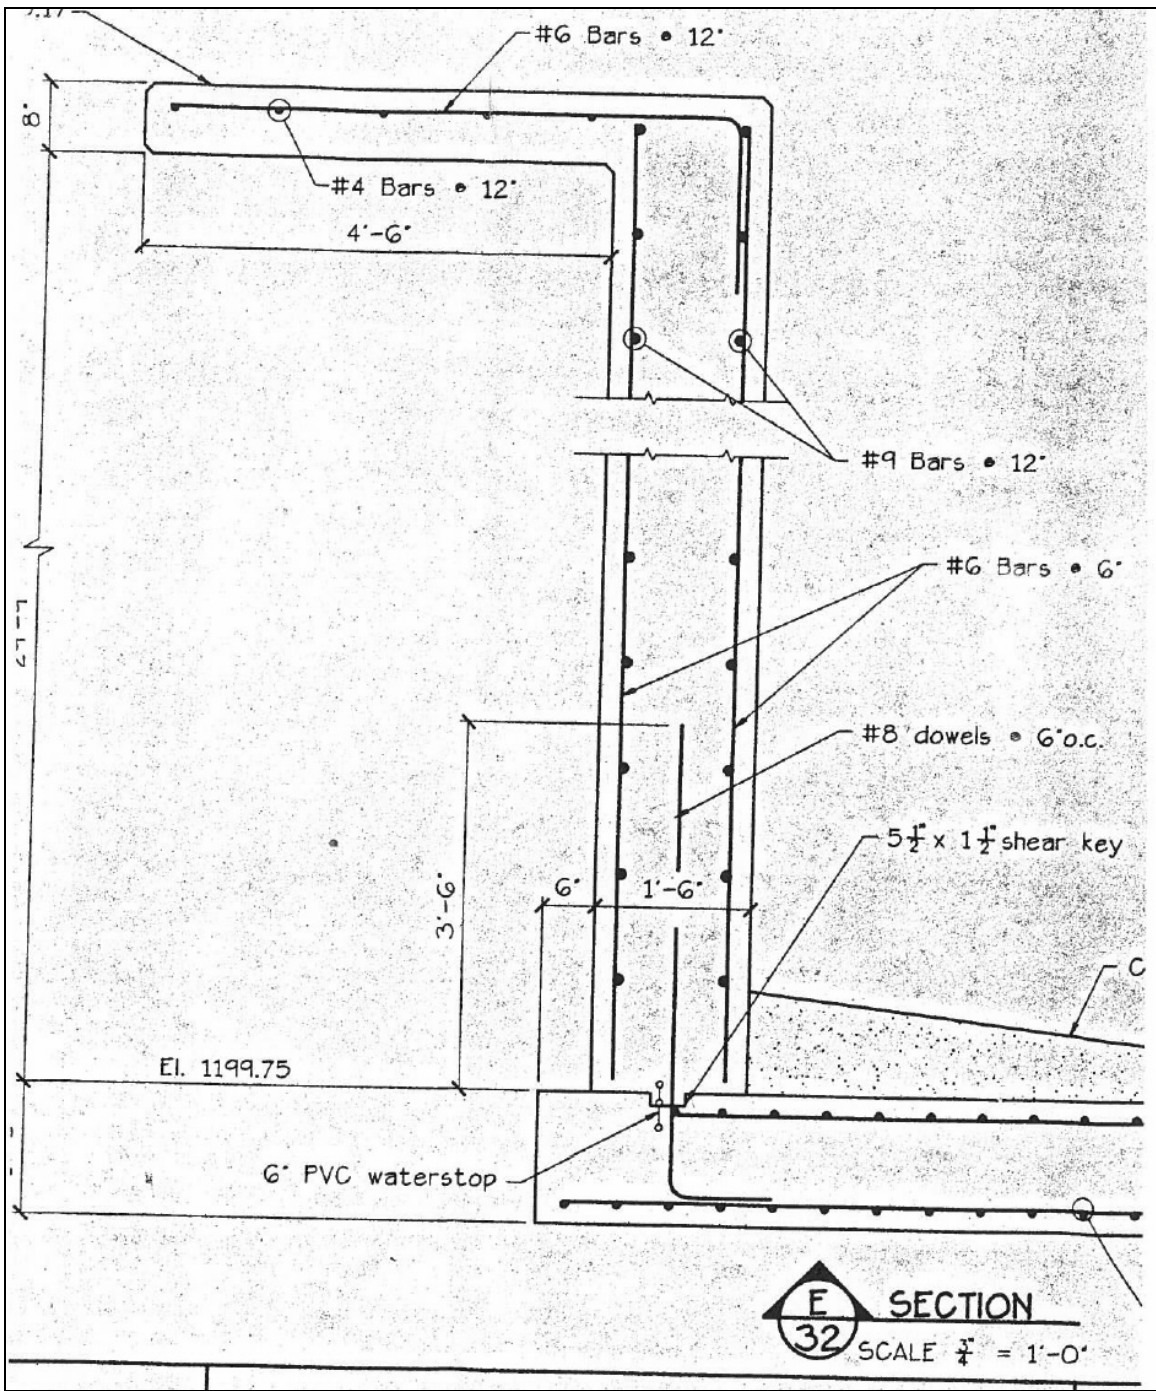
Vertical Section Showing Reinforcement for East Wall
